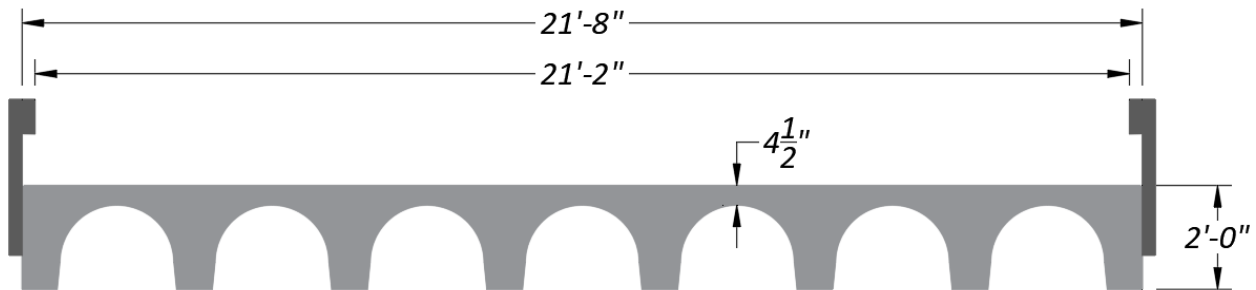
Longitudinal Section of Bridge CM-5 (adapted from TxDOT 2018b)
